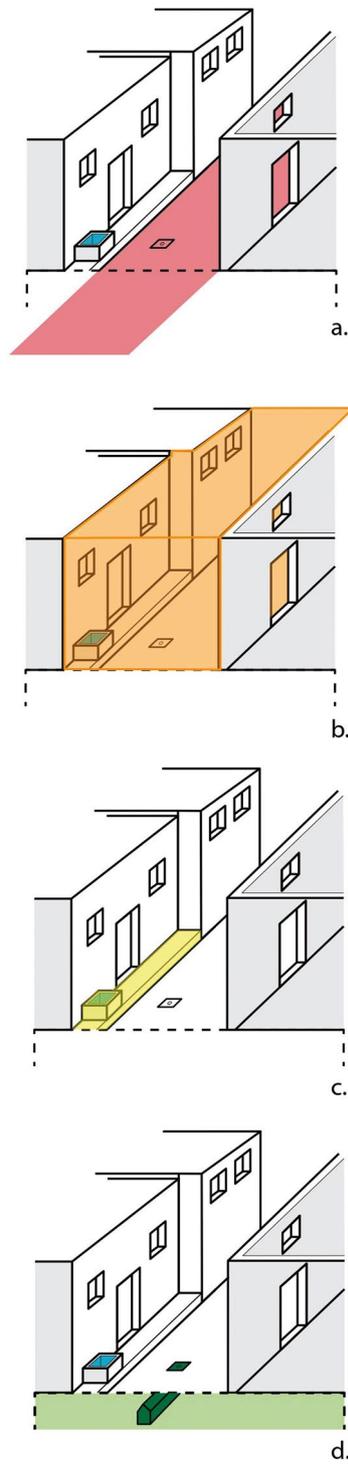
The basic components of a street: a. the layout of the street; b. frontages constituting a volume; c. street furniture (fountains, pavements, etc.); d. sewer and water facilities.
